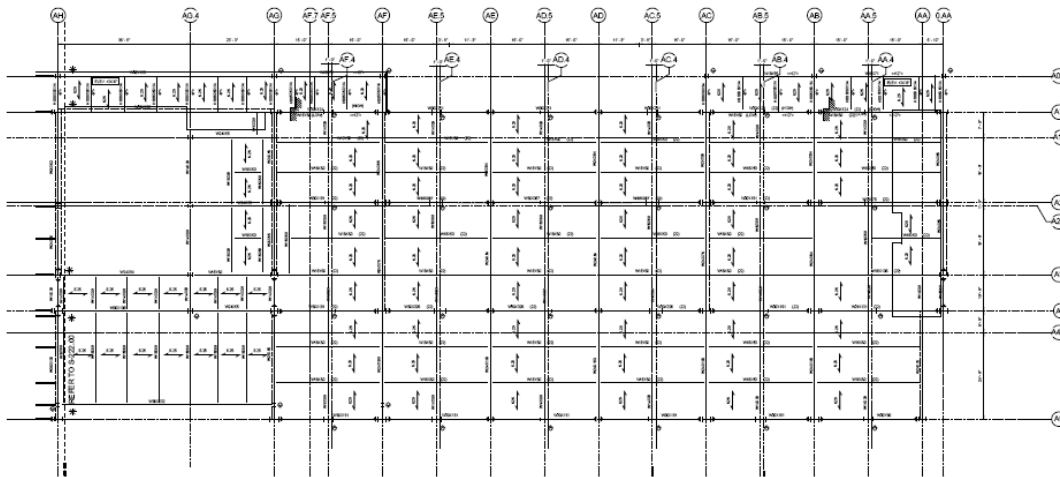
THIS IS THE TYPICAL FRAMING PLAN OF ONE FLOOR OF THE NEW YORK POLICE ACADEMY. PLEASE NOTE THAT THE BUILDING IS SO OBLONG THAT EACH FLOOR PLAN IS SPLIT INTO TWO SHEETS WITH PART 1 (THE WEST END) AND PART 2 (THE EAST END).
